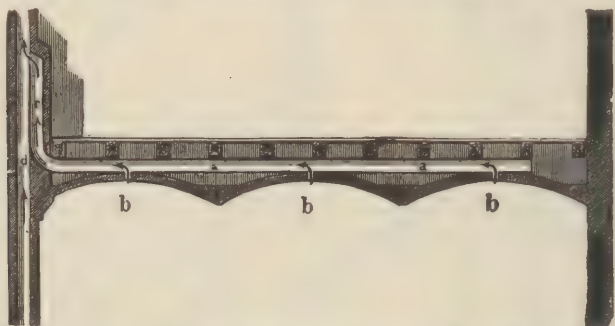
Longitudinal section of a stable with arrangement for withdrawing the air toward the flue.
